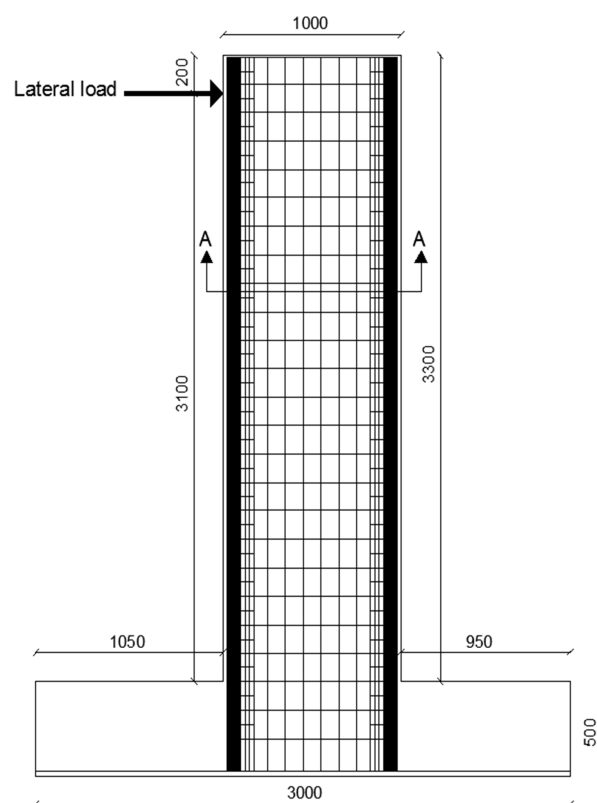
Dimensions and elevation view of the reinforcement layouts of CSW test specimen (Dimensions are in mm)
